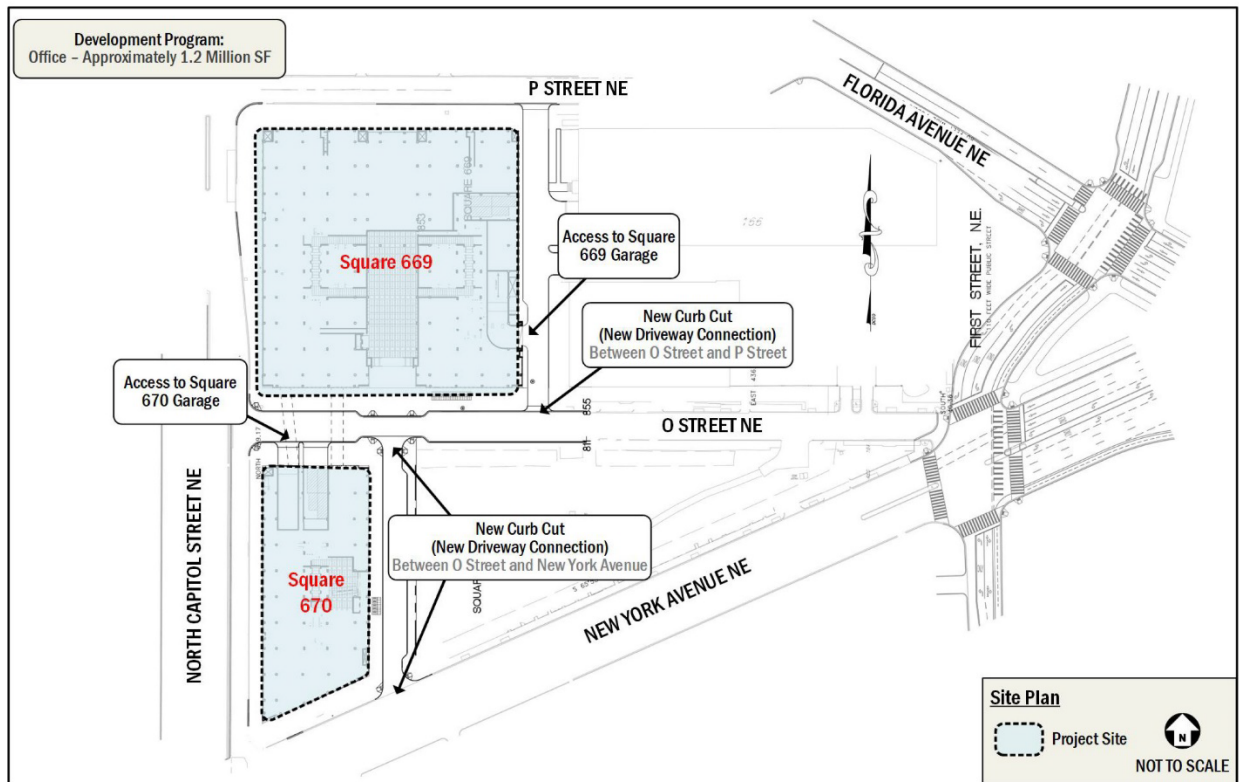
Site Plan Showing Access Points (Source: Grove/Slade)
